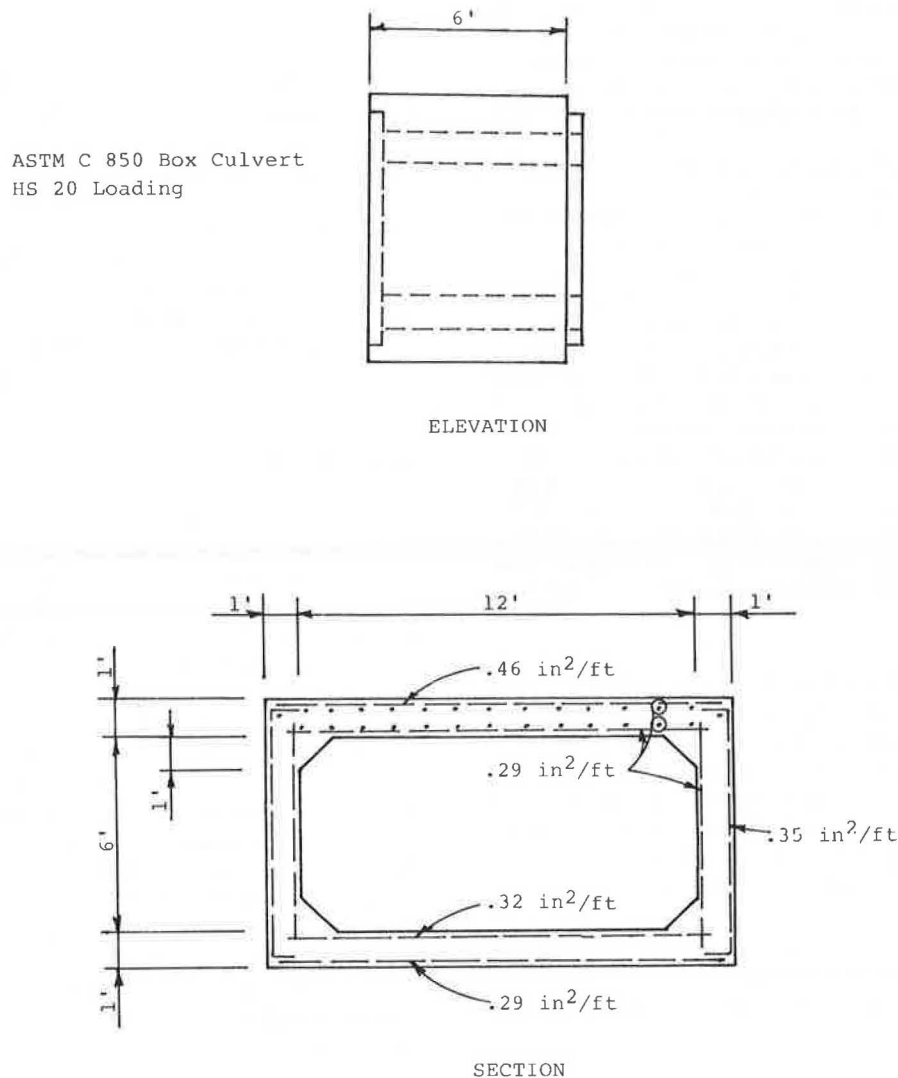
Details of 12-ft by 6-ft box culvert (Ohio DOT bridge MAR-309-09.42).
